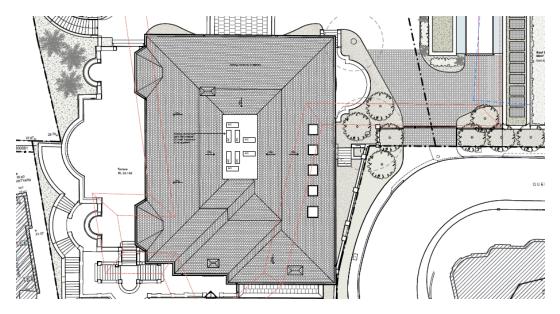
Roof plan (Drawing No. 1103 prepared by Tzannes)
